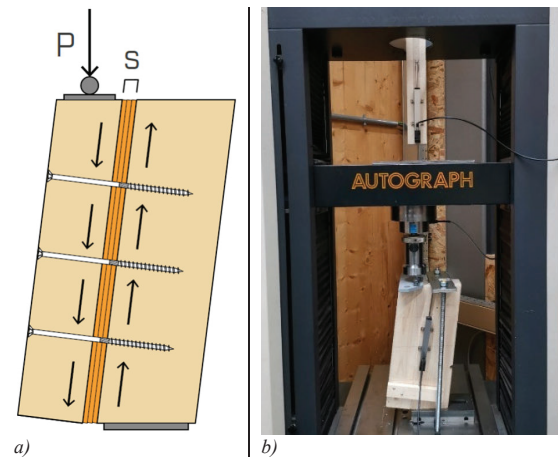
a) Scheme of test layout; b) Photo of adopted setup.
